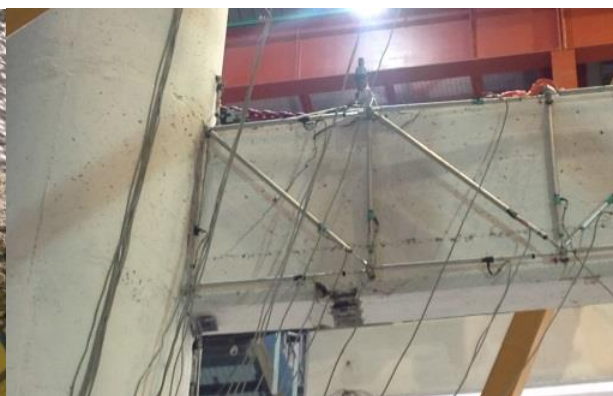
Crack pattern in the first transverse beam of tall pier after test k12
